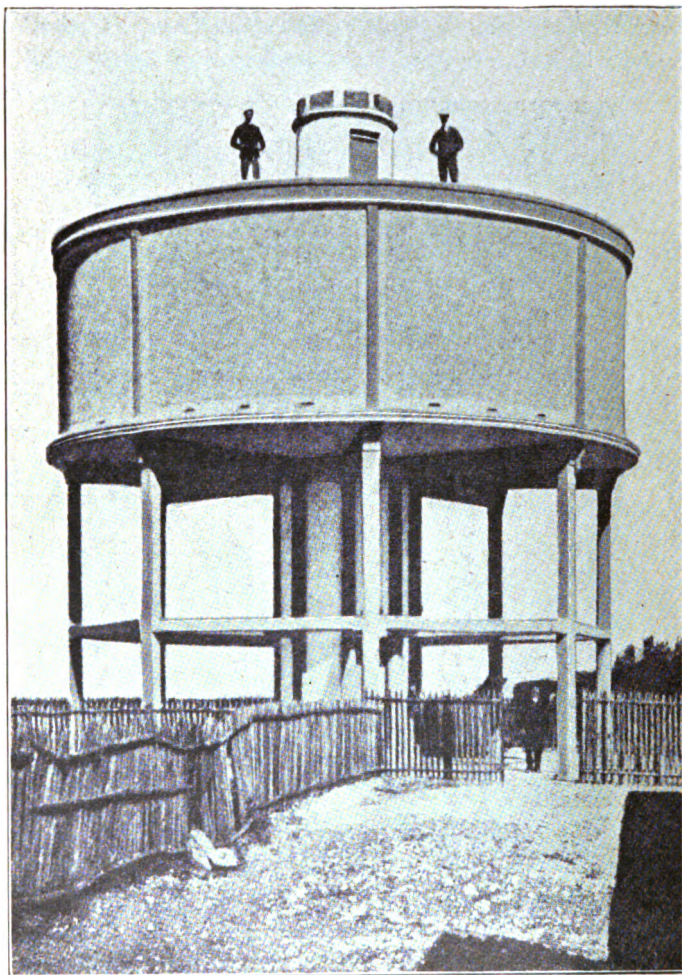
65,000 Gallon Water Tank with Hollow Walls. Roof covered with a layer of earth one foot thick. Concrete housing for pipes and pump.
